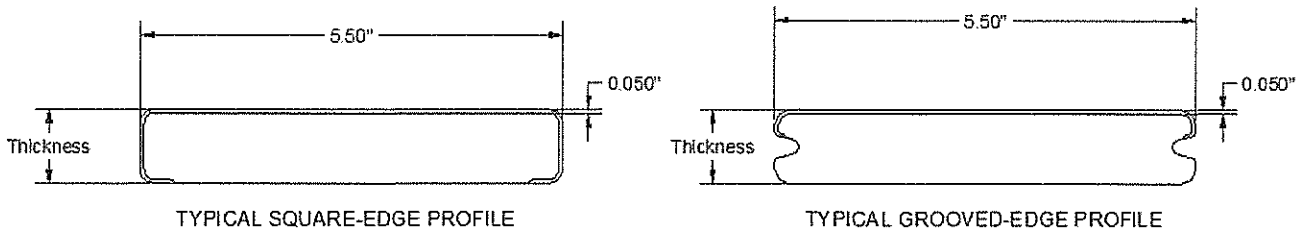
TYPICAL TREX[®] DECK BOARD PROFILES
